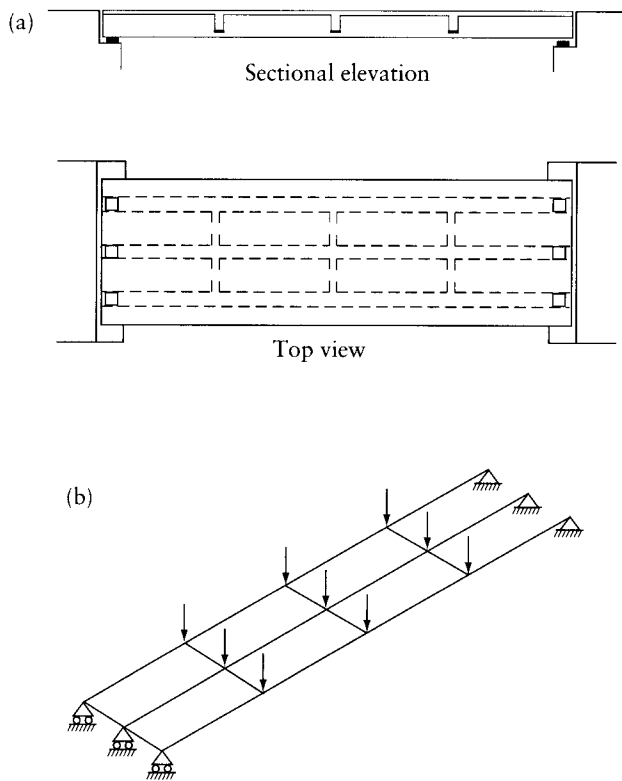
Idealization of a bridge deck as a grid. (a) Plan and sectional elevation of concrete bridge deck. (b) Grid idealization.
